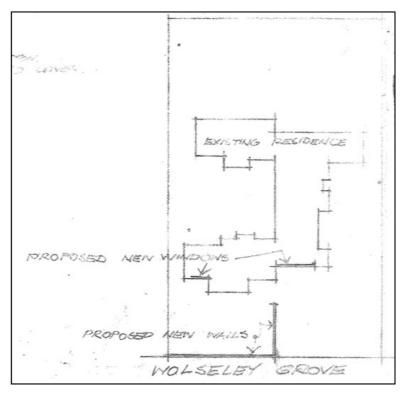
Site plan from 1986 Building Permit, showing the location of the windows and walls introduced at that time. (permit sourced by property owner)
